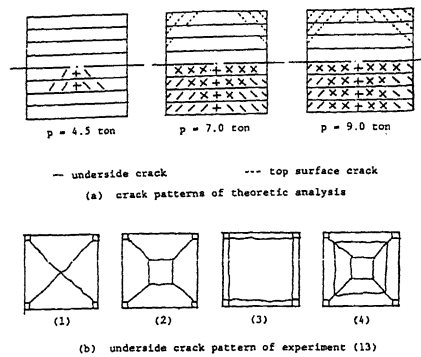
Crack Pattern of Concrete Slab S1
